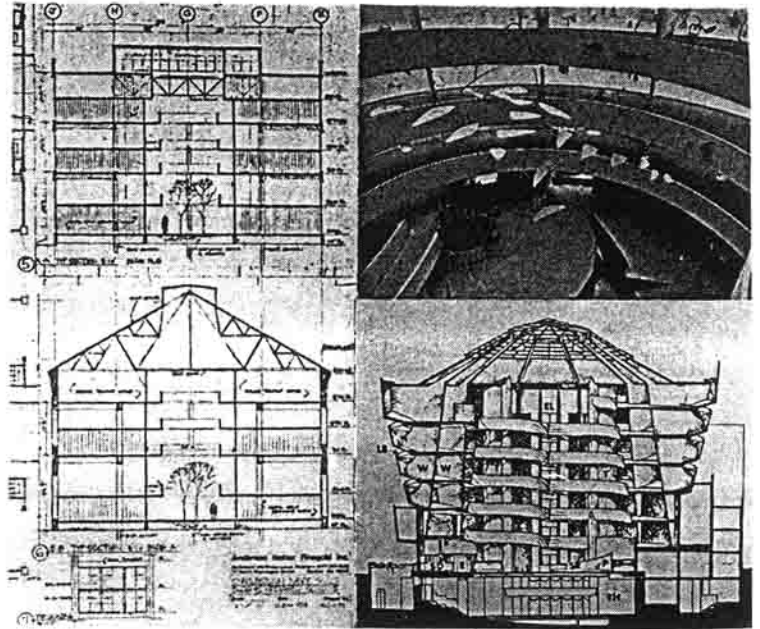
(Left) Initial concept drawings of Constitution Quarters, Buildings N, S, & A, showing mall space and utilization of existing structure. (Right) Solomon Guggenheim Museum, New York, interior photo and section showing trunks with cantilevered corridors.
